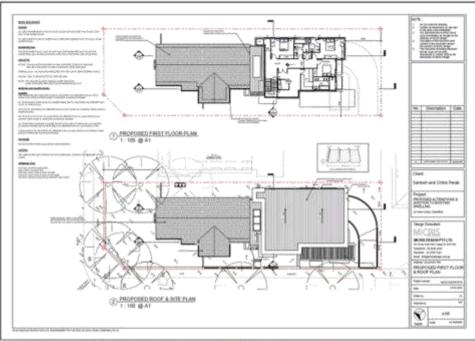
Proposed first floor and roof and site plans (received by Heritage 21 on 7 October 2020).
